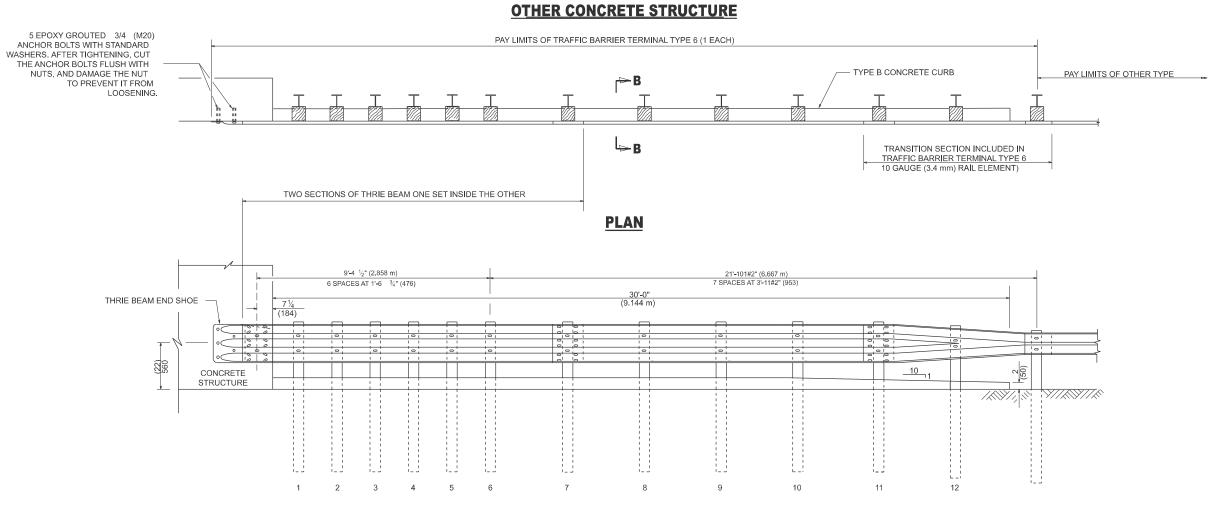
DETAIL OF CONNECTION OF GUARDRAIL TO SQUARE BRIDGE PIER OR FOUNDATION.
